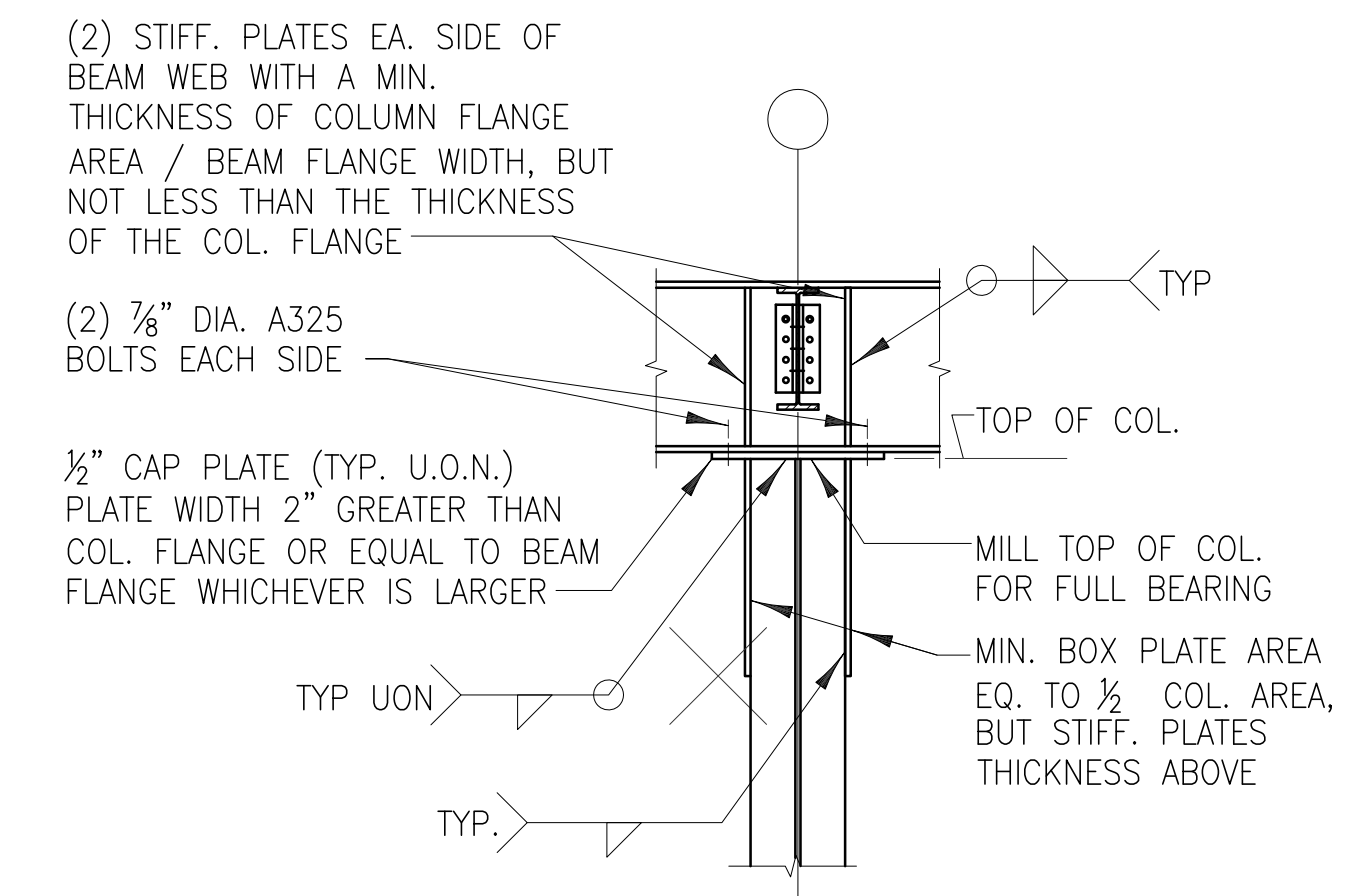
DETAIL - TYPICAL BEAM TO COLUMN MOMENT CONNECTION
